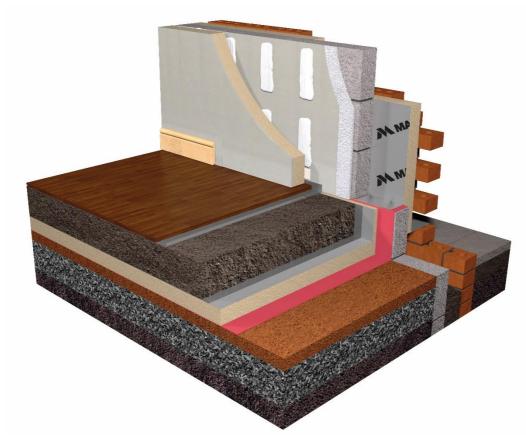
Internal insulation of masonry wall with plasterboard laminate
